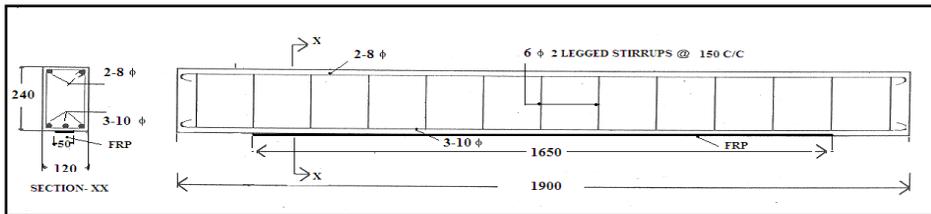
TYPICAL GEOMETRY, REINFORCEMENT DETAILS AND FRP CONFIGURATION OF BEAMS (Group B-Config. 1)
